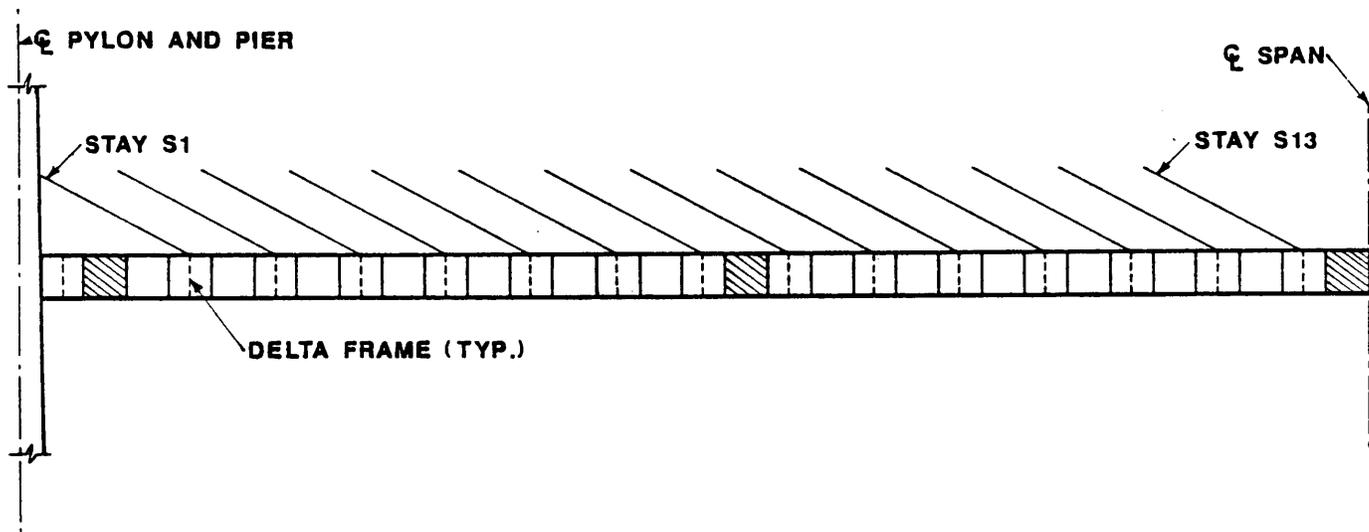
Sections for strain gaged dummy rebar instrumentation.
